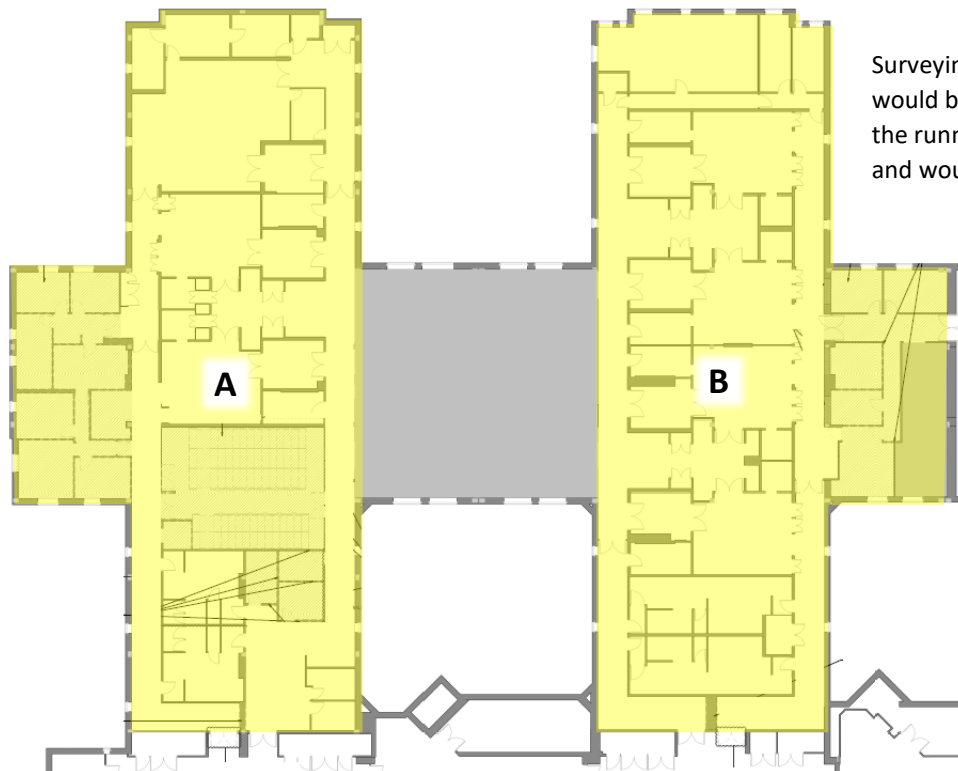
SITE PLAN AND BUILDINGS WITHIN SCOPE
